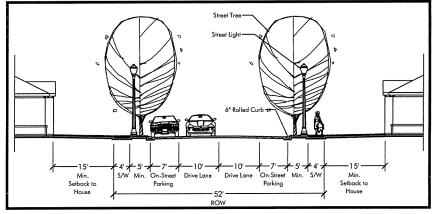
Cul-de-Sac Street - Woodbridge by Del Webb, Section C
